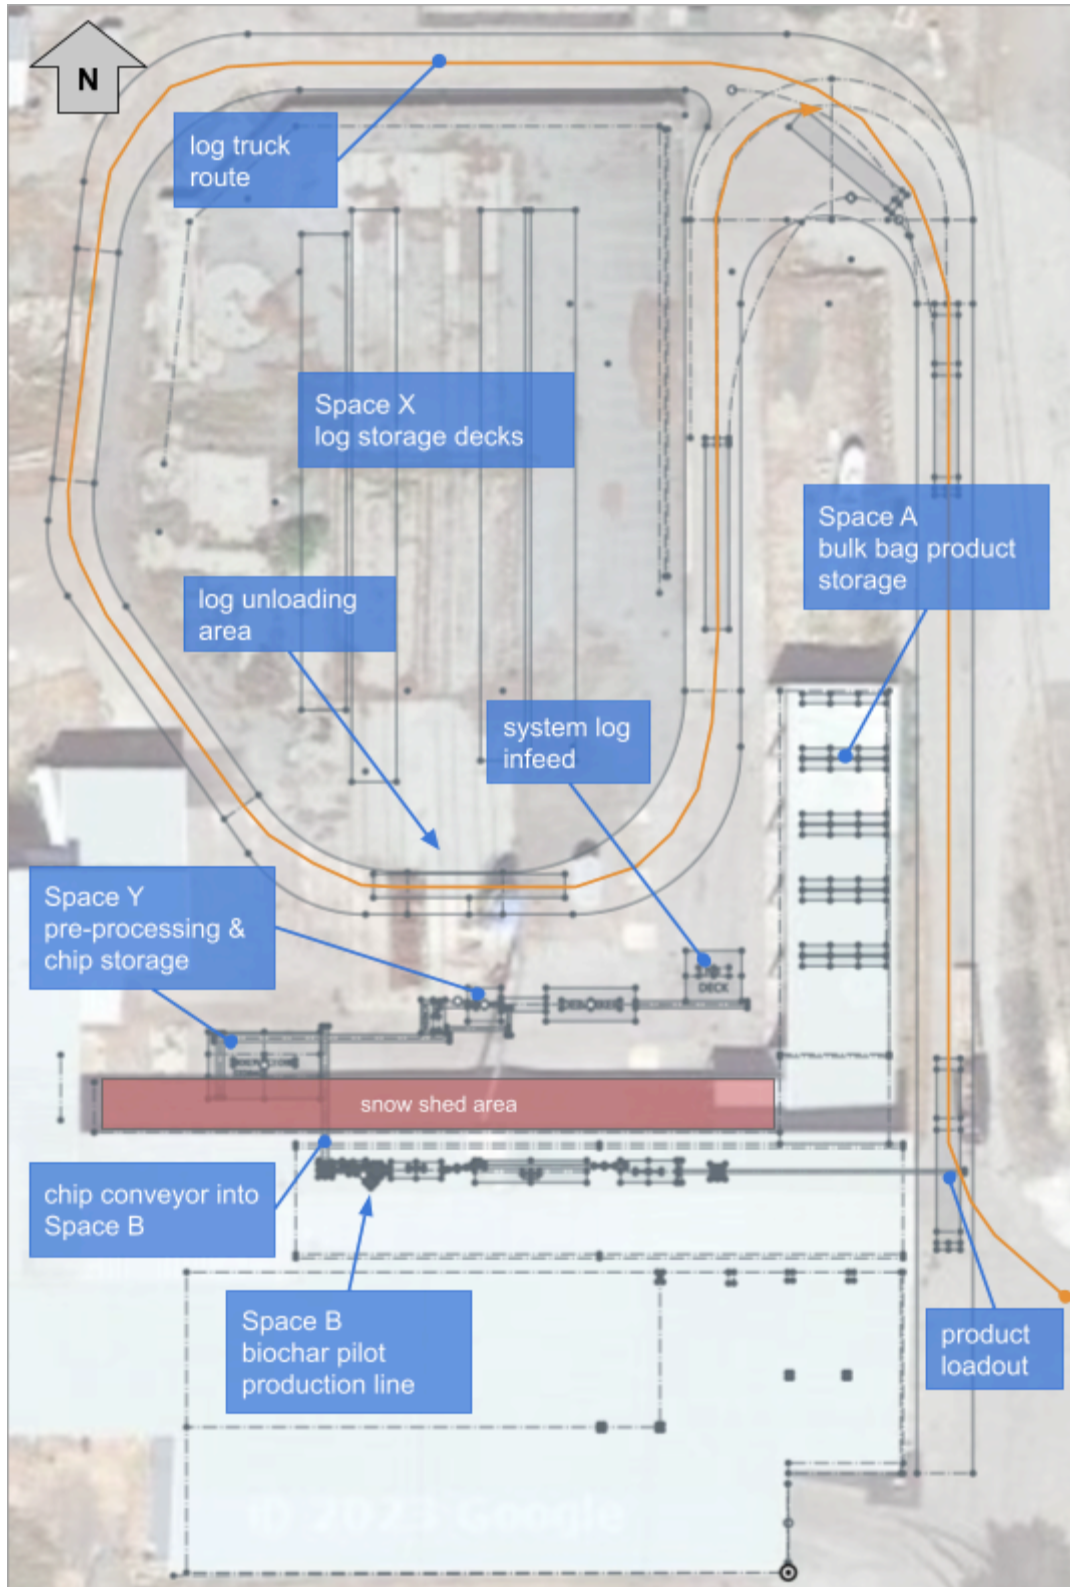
Concept SL.1, a site layout concept considered early in the Winton mill site analysis.
